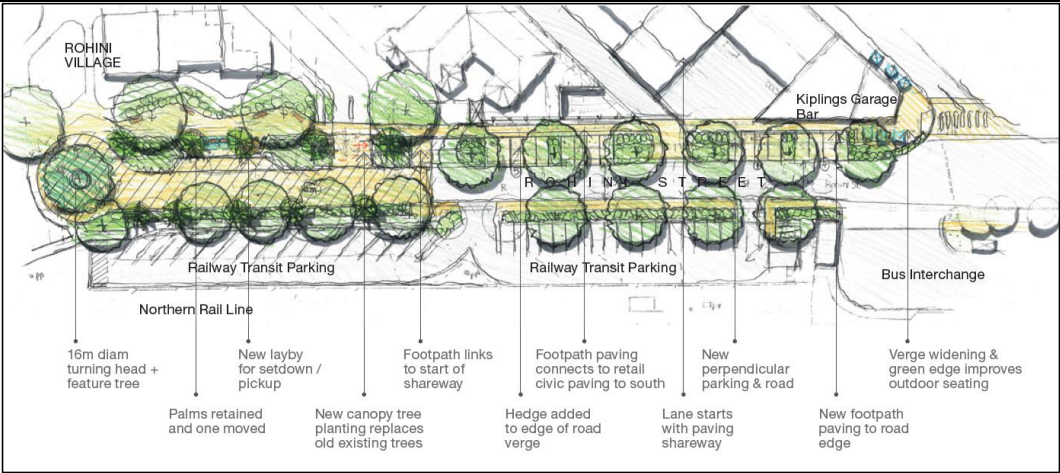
Potential upgrades Rohini Street, subject to a Planning Agreement Source: Site Image
